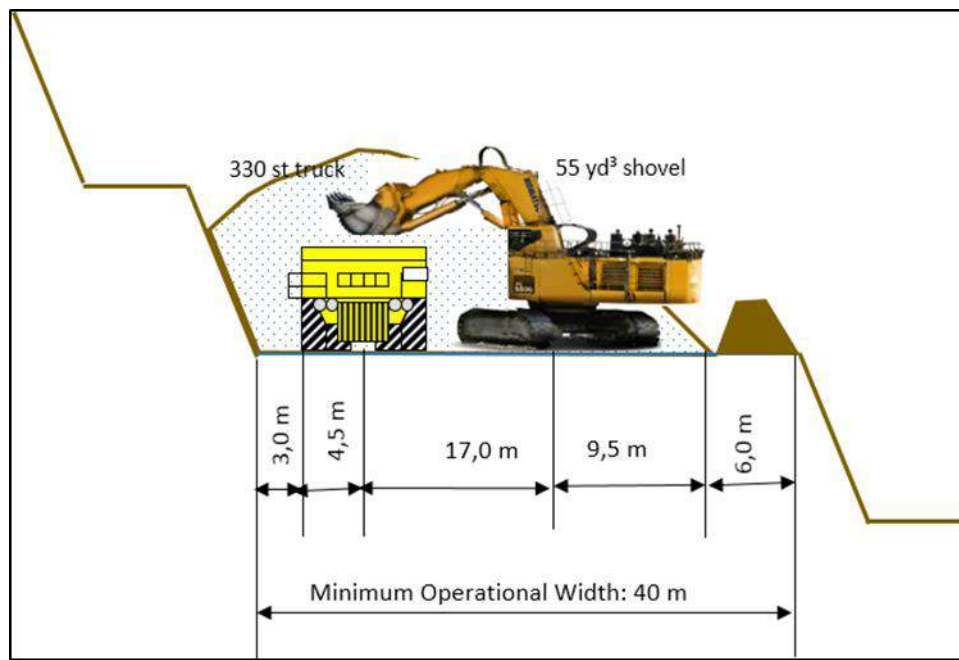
Hydraulic Shovel Loading from One Side (Bench End)
